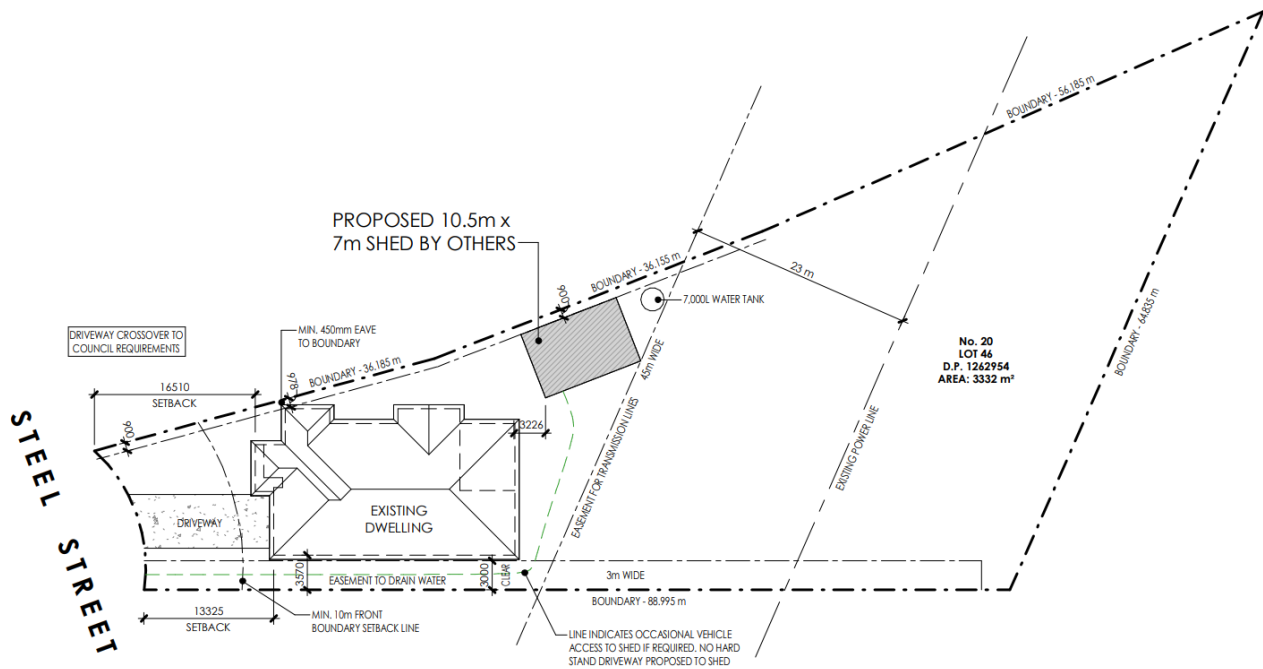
LAYOUT (SUNRAI DESIGNS)
